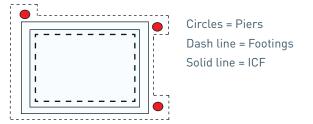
Basement ICF, Concrete Pier, and Footing design.
